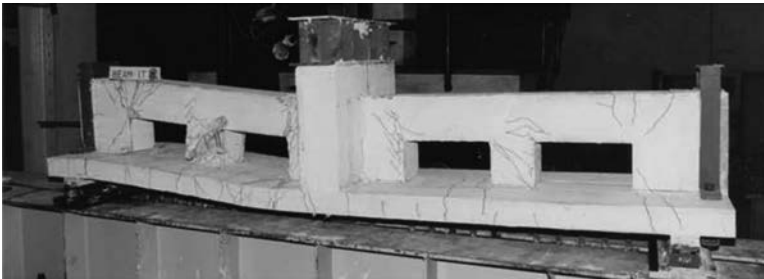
Failure of a beam with multiple rectangular large openings. (Adapted from Tan, K. H. et al., *ACI Structural Journal*, 93(3), 1996, 404–411.)
